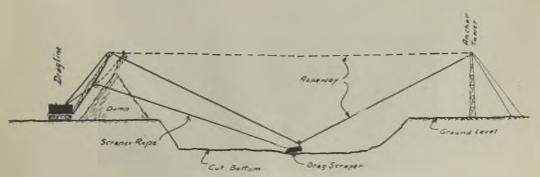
SECTION SHOWING DIGGING AND DUMPING POSITION OF DRAG-SCRAPER.
